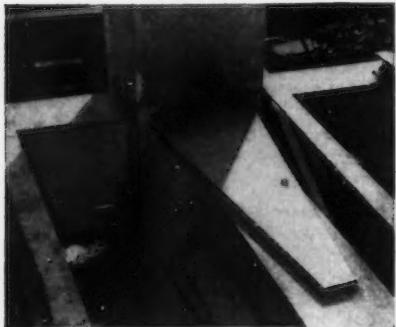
Beam to column connection on 11-story apartment, 1200-ton frame erected with 25% less steel. Engineers and Contractors: Byrne Organization, Inc., Washington, D. C.
